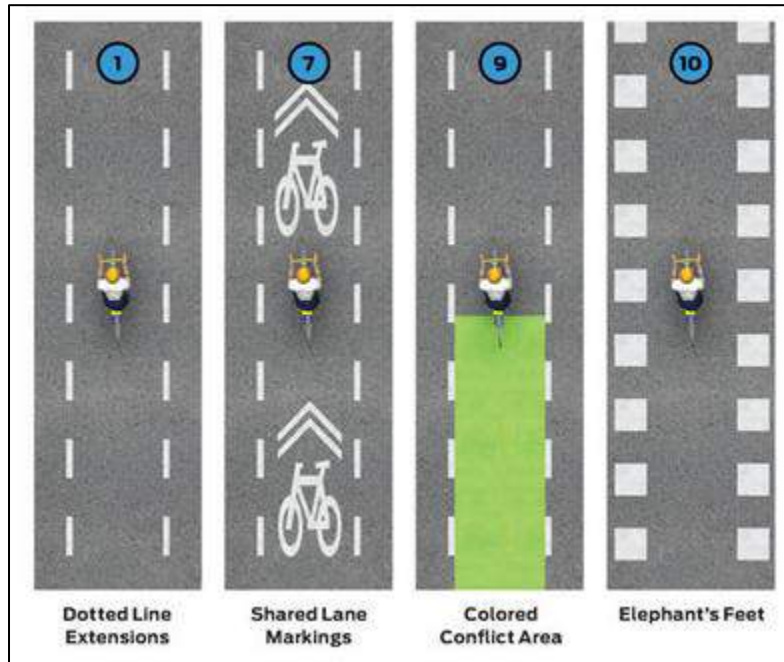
Pavement markings for intersection crossings (adapted from NACTO, 2011)
